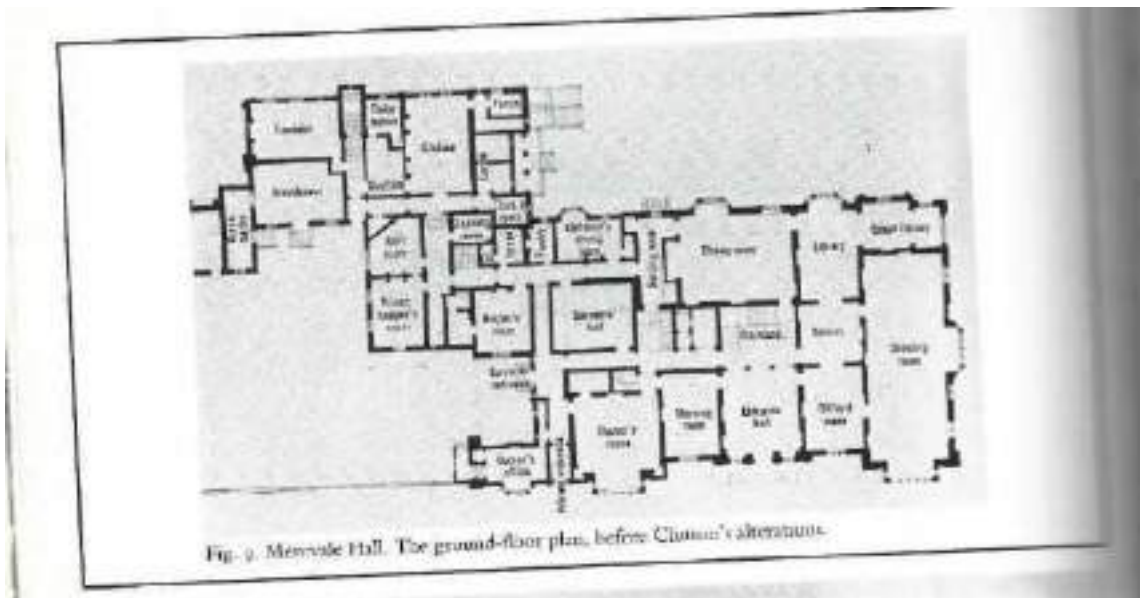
Merevale Hall. The ground-floor plan, before Clutton's alterations.
